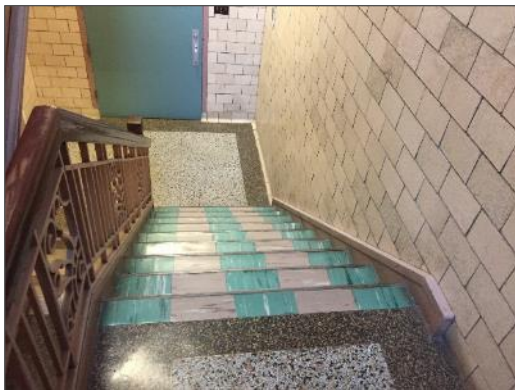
Asbestos-containing 9" x 9" vinyl floor tiles, green/brown with white lines, Stairwell from Level 0 to Level 1.
